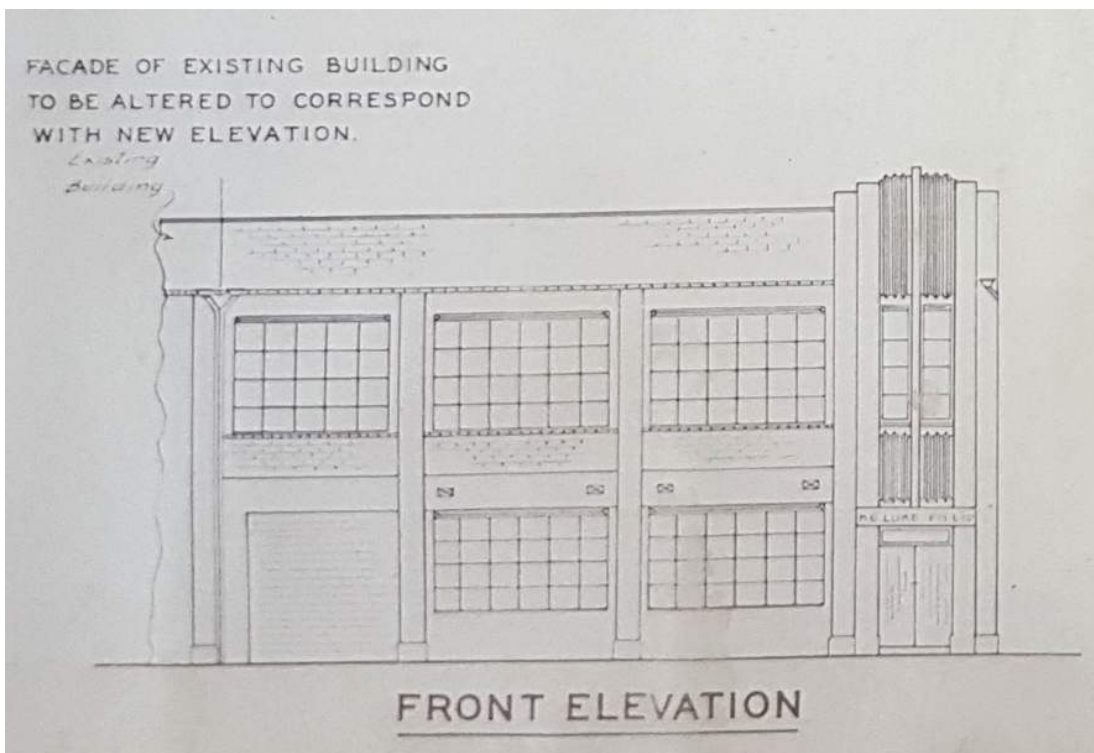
1937 drawings – the proposed facade to the new section. The annotation top left indicates the facade of the existing section to the west was to be altered to match this new facade (PROV, 1937).
